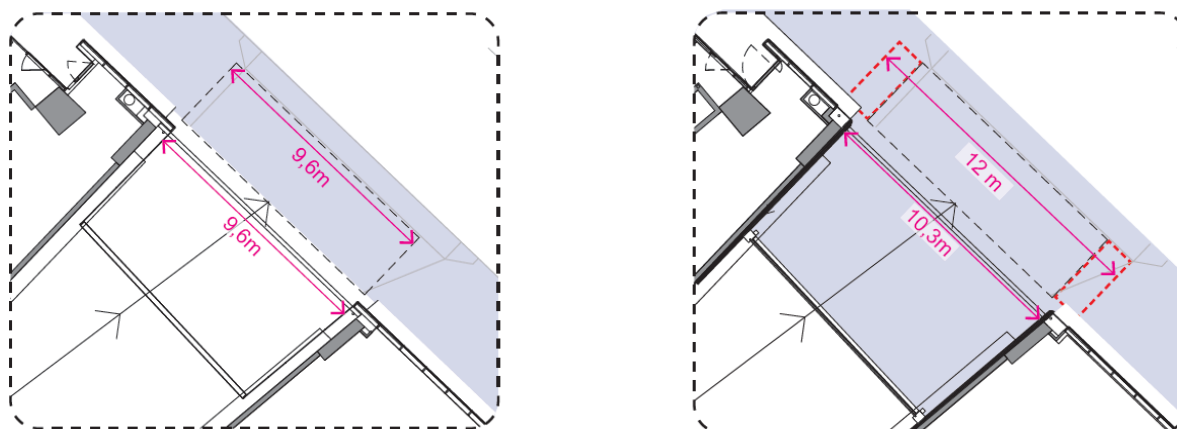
Approved driveway entrance (left) and proposed, widened entrance (right)
